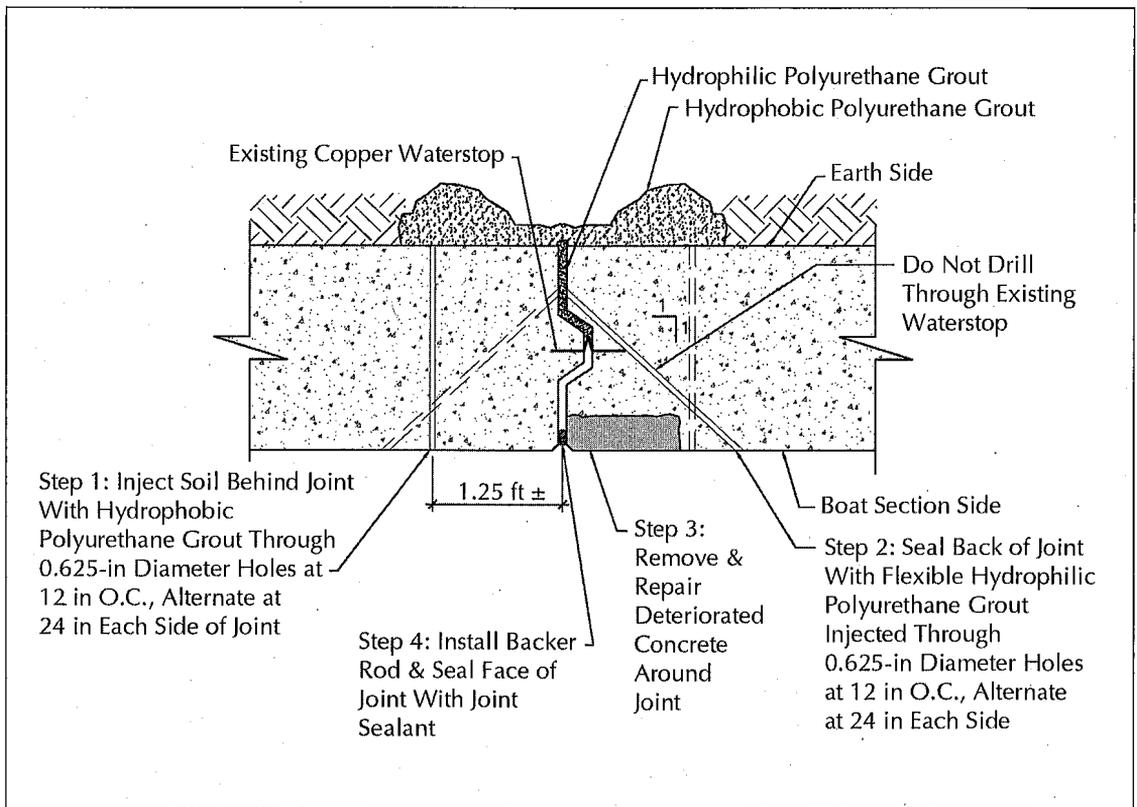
Polyurethane waterproofing detail at wall joints.
